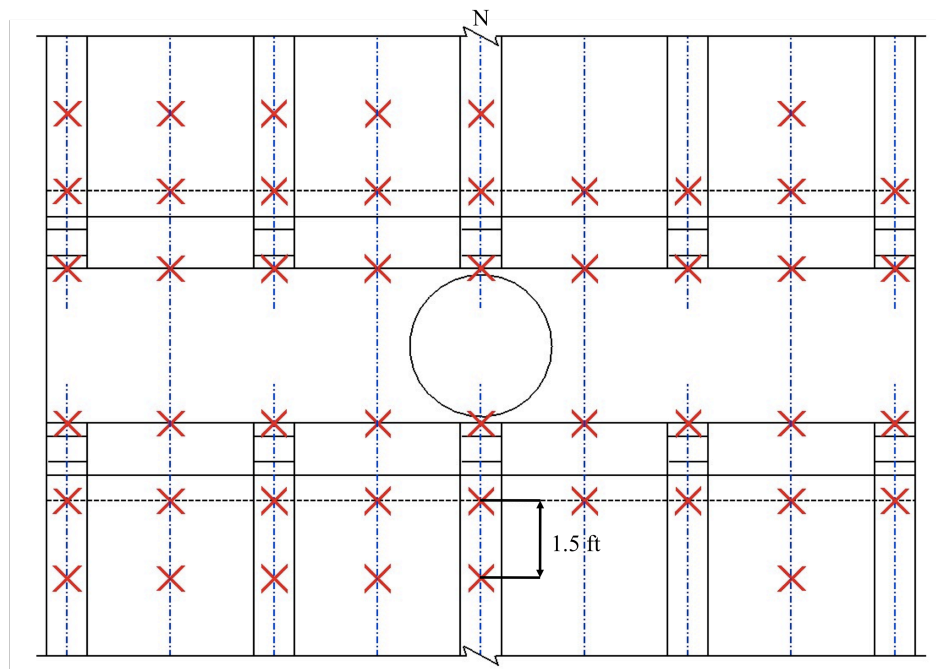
Deck Reinforcement Strain Gauge Layout
